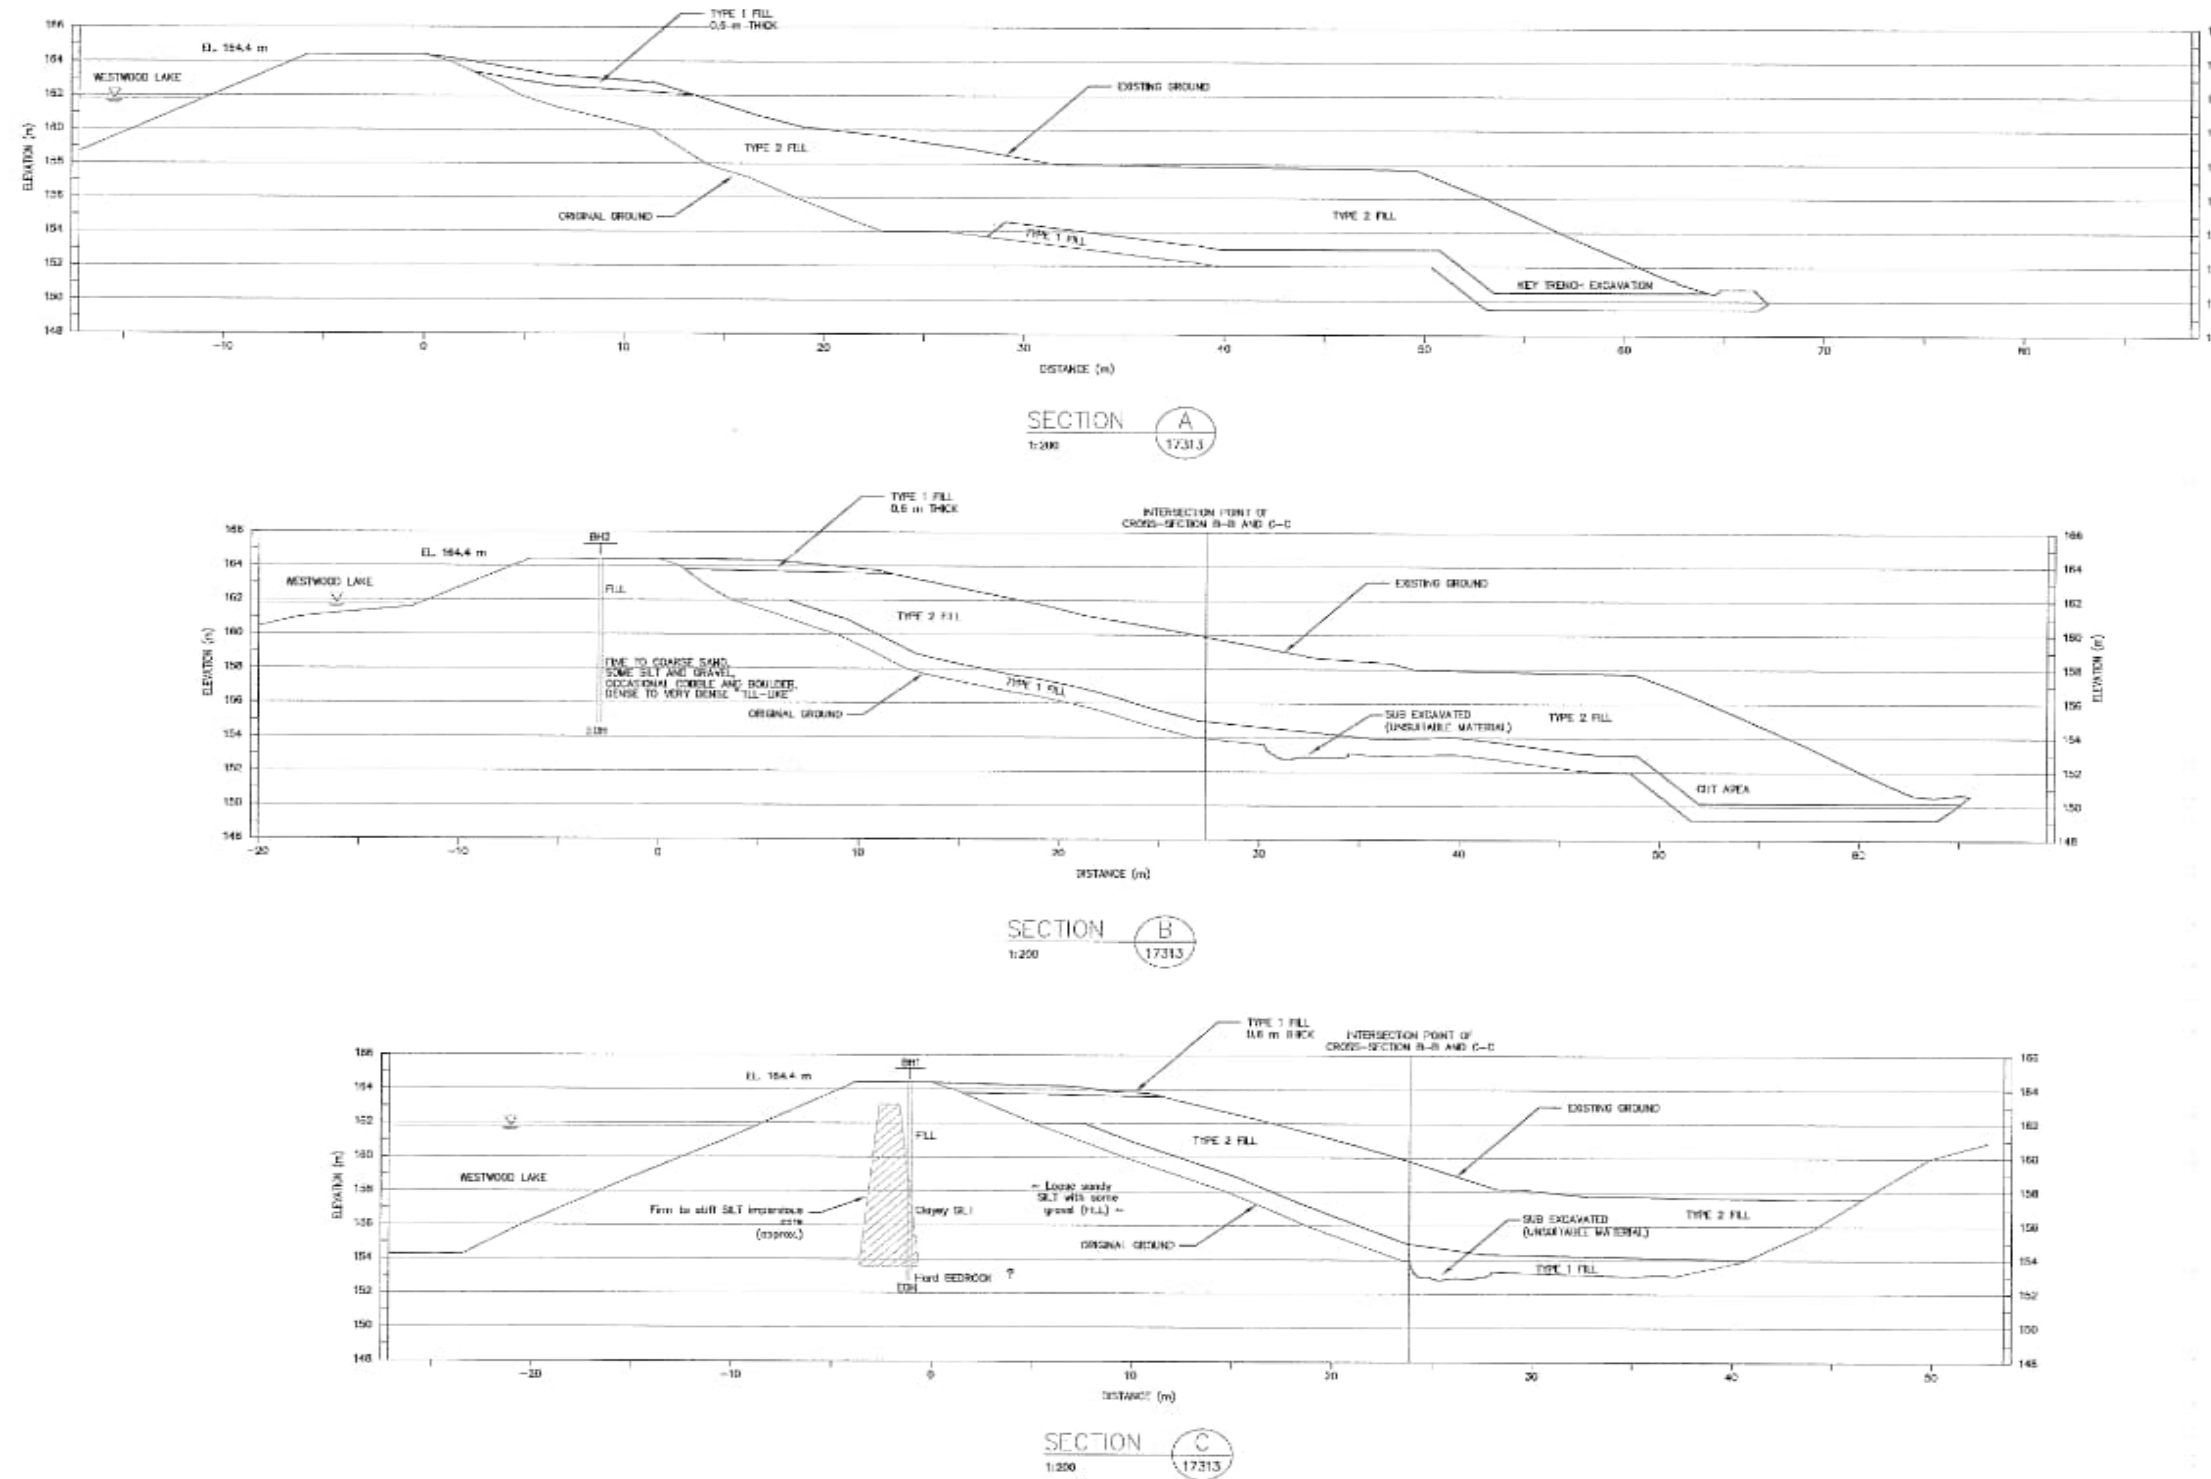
Cross Sections of Westwood Dam (Provided by The City)
